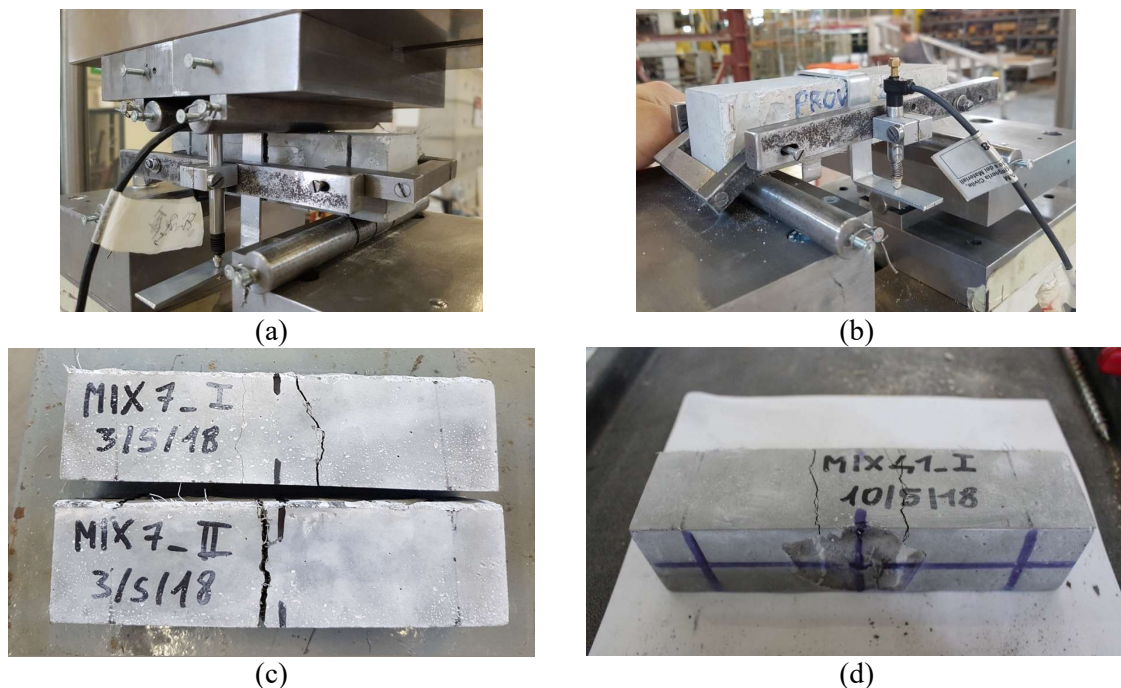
Four point bending tests (a) Specimen equipped with the alluminum frame where LVDTs are placed; (b) Specimen before the test; (c) Example of localized crack generated by a flexural load; (d) Example of multi – crack pattern.
